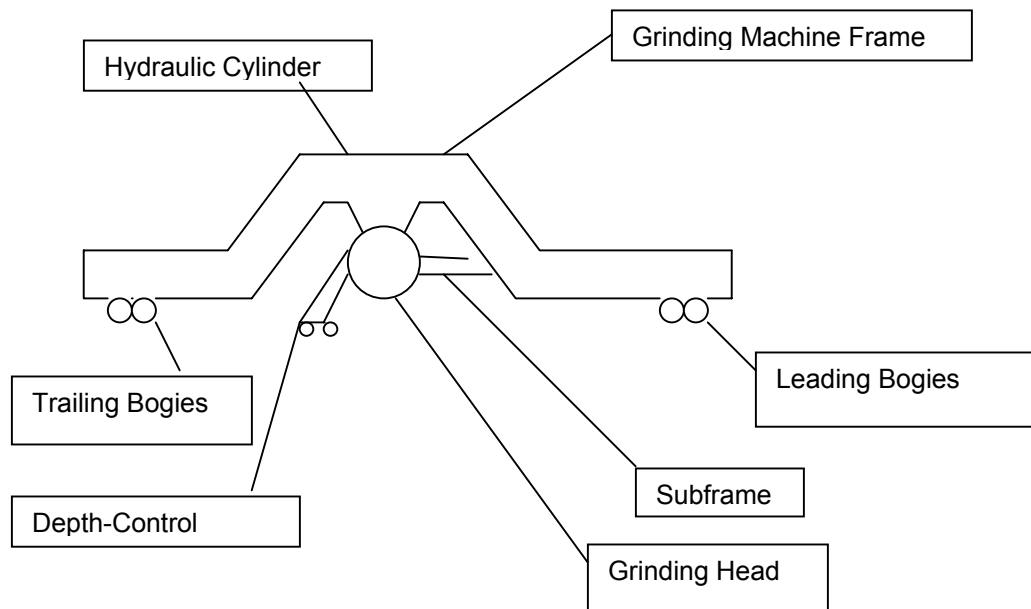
Components of a Grinding Machine [ACPA 2000]
